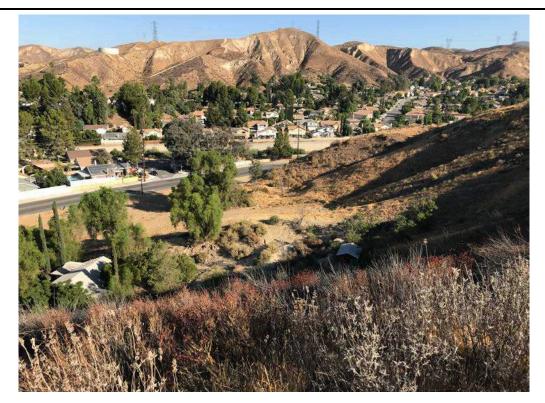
View of the onsite residence, looking west towards Bouquet Canyon Road.
